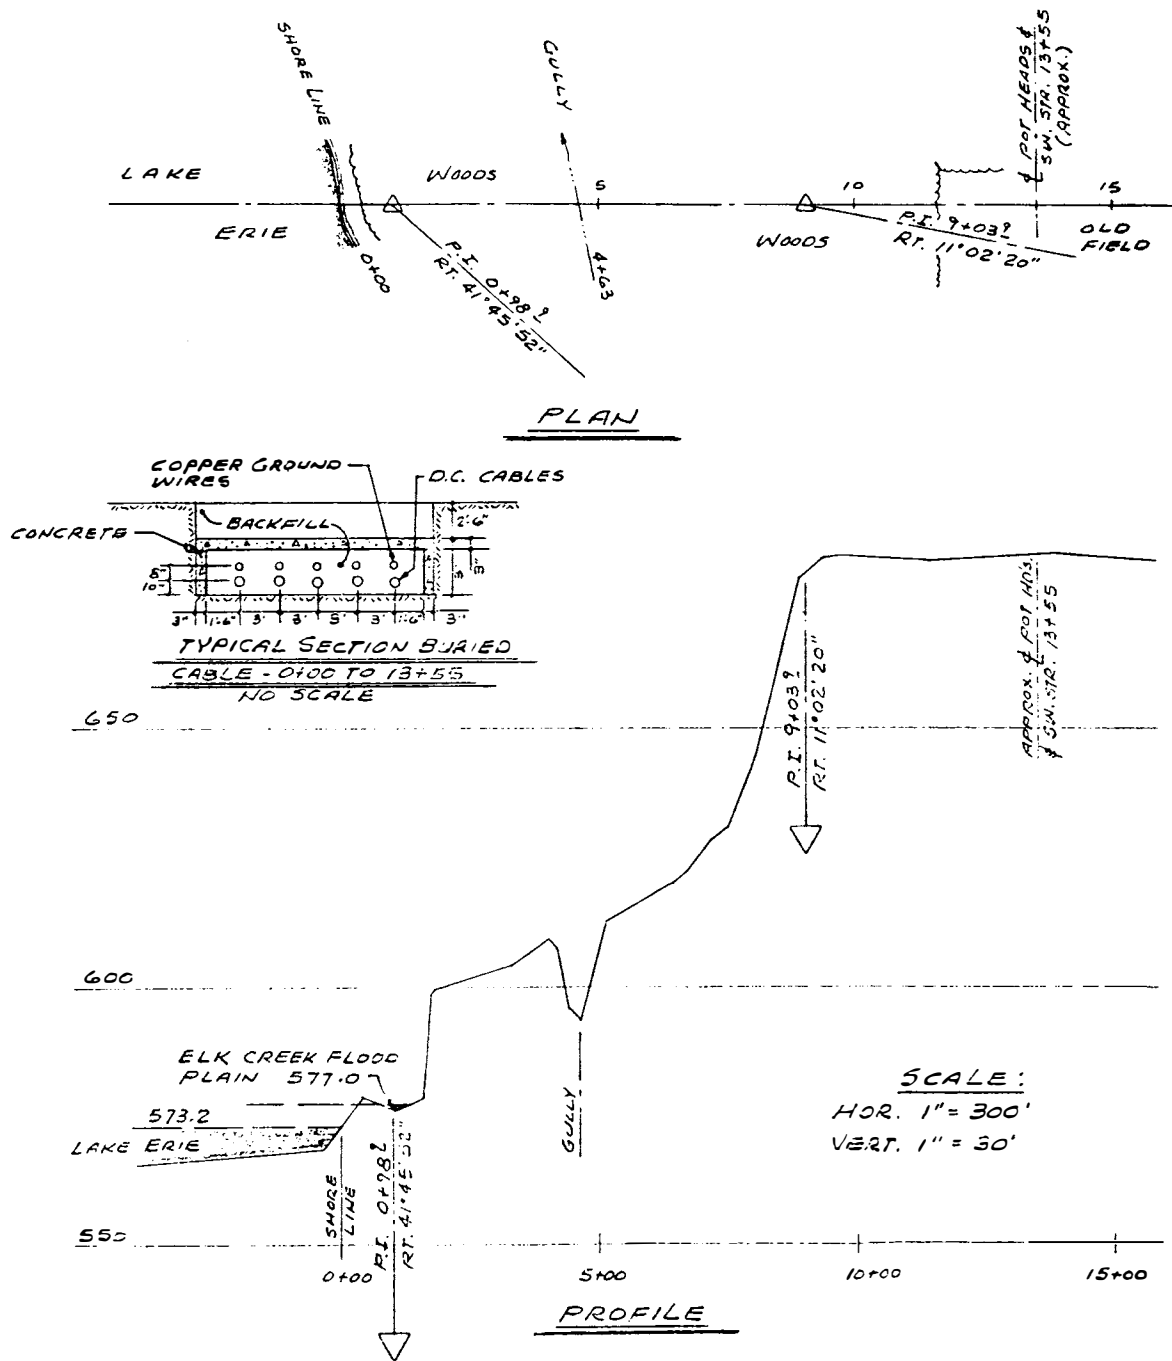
Plan and Profile of Underground Cable Route from Lake Erie Shore to Coho Switching Station. From GPU 1981b.
